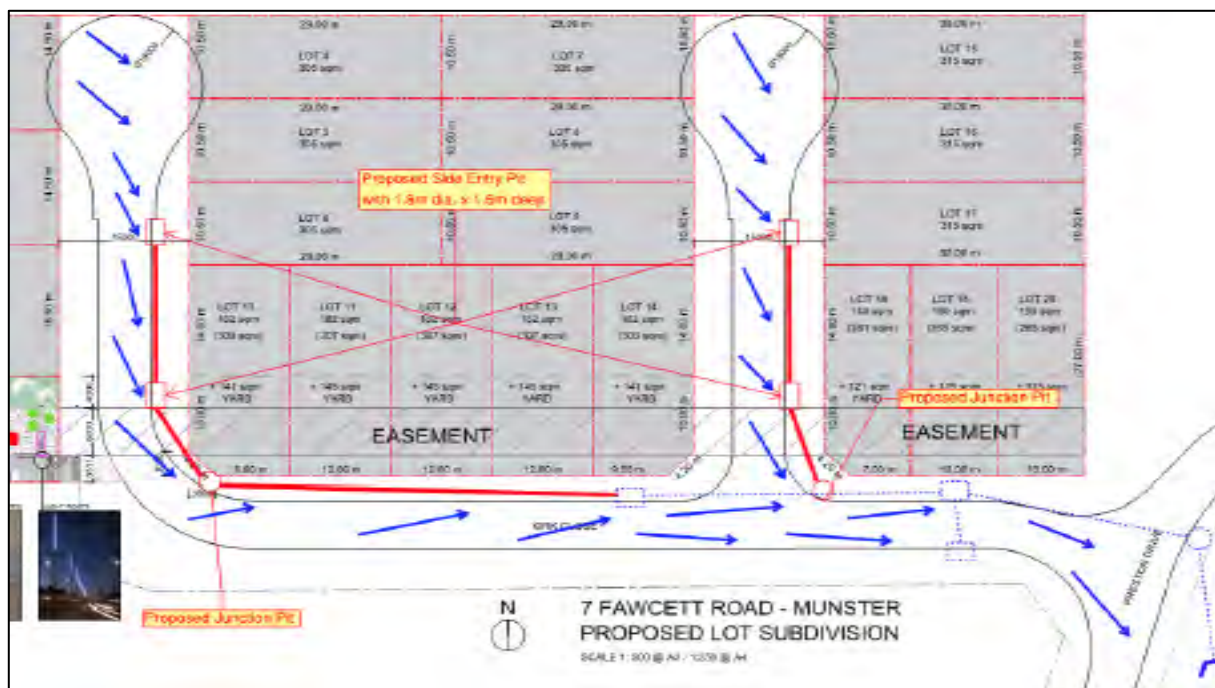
Proposed Drainage Strategy by McDowall Affleck
